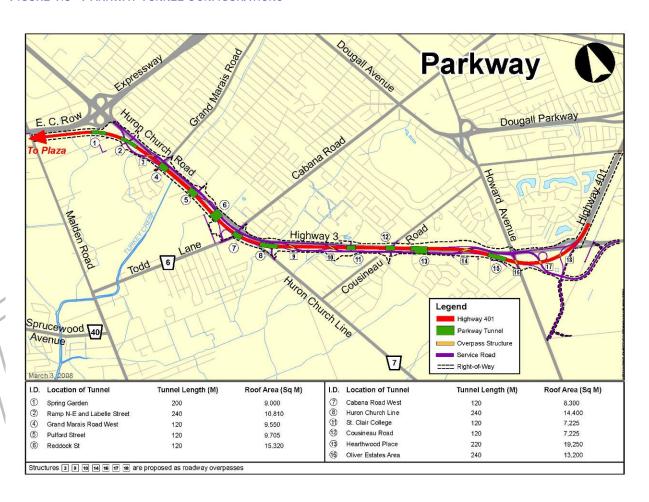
PARKWAY TUNNEL CONFIGURATIONS
